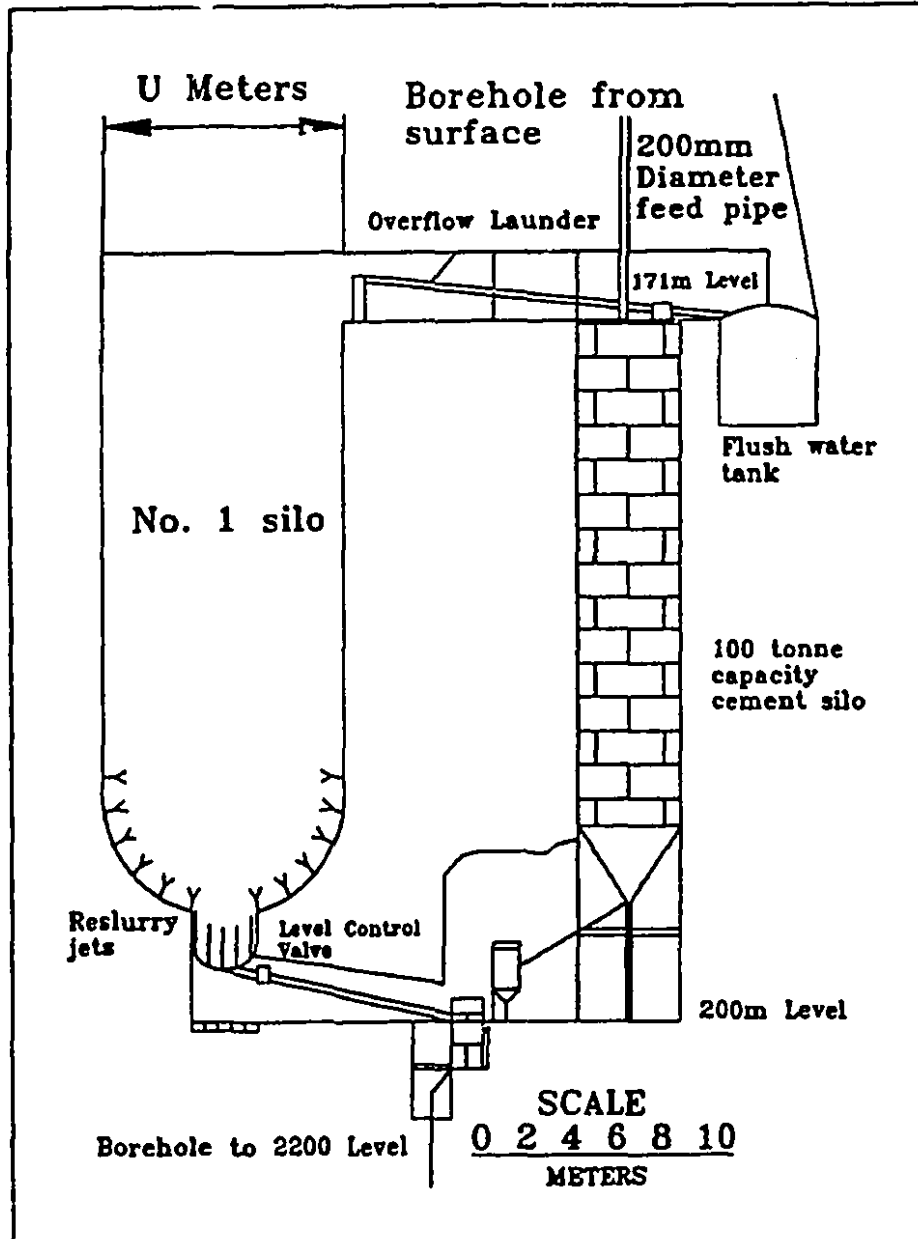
Schematic of an underground fill station in the Mufulira Mine, Zambia<sup>[47]</sup>
